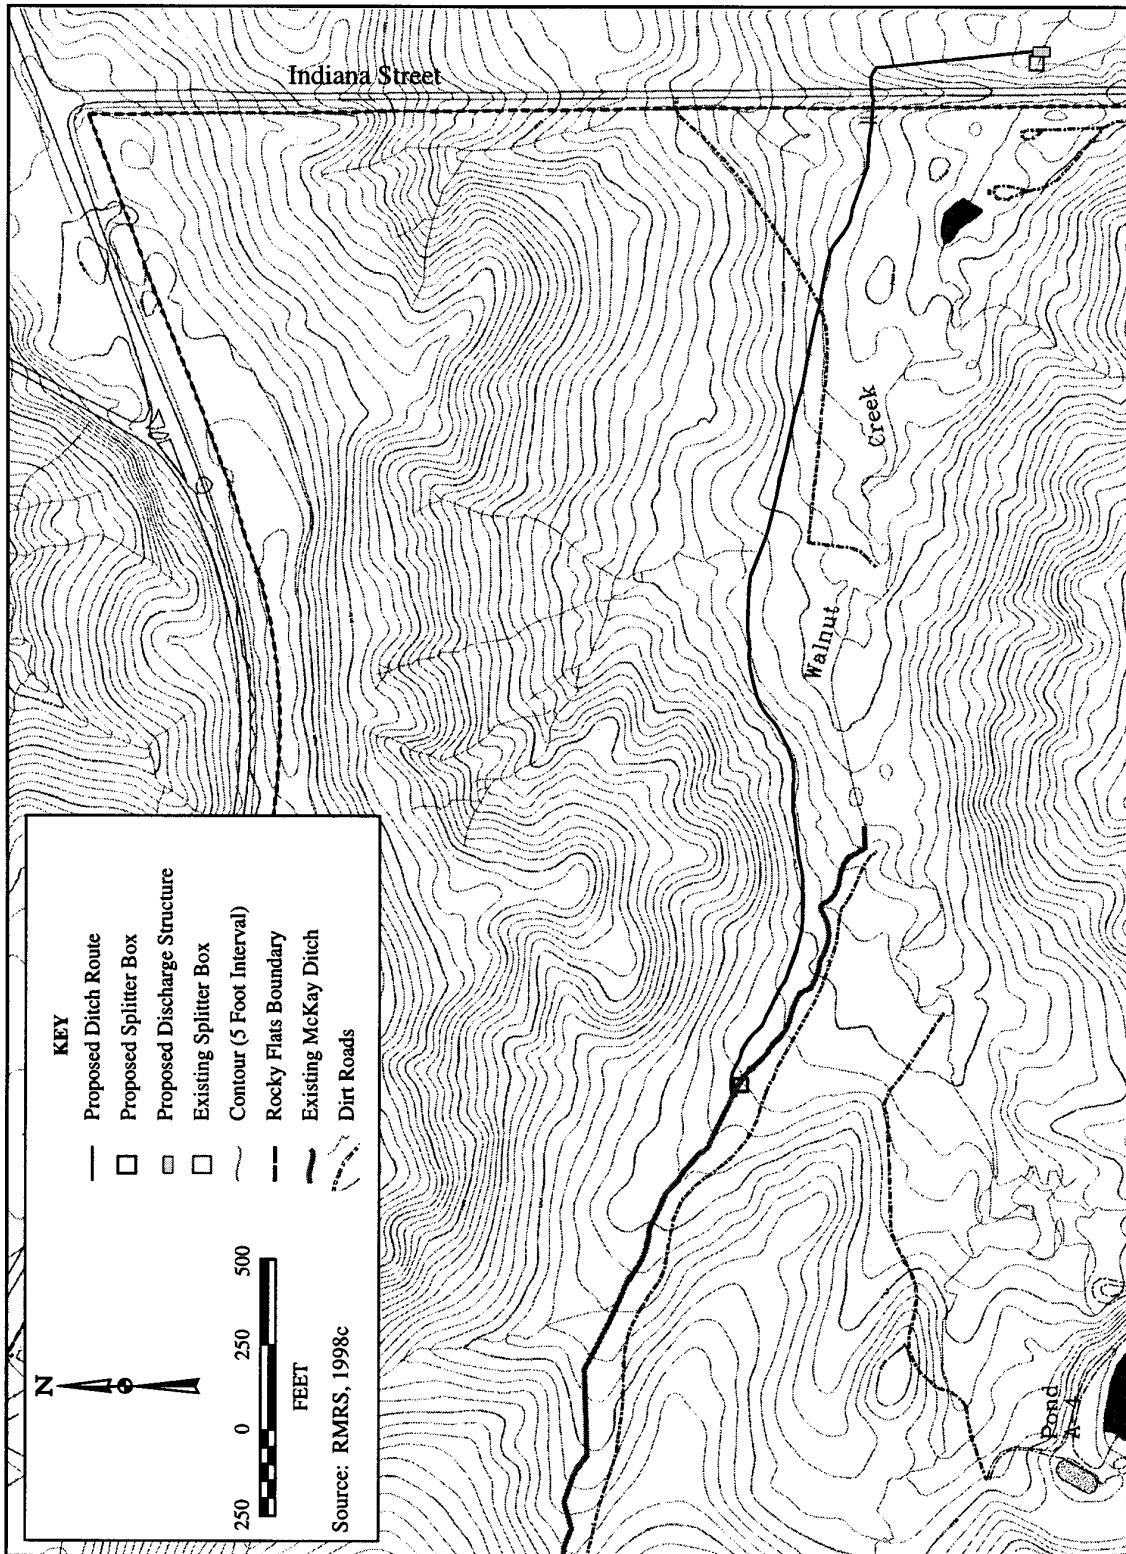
McKay Bypass Canal Extension Route - Open Ditch Alternative
